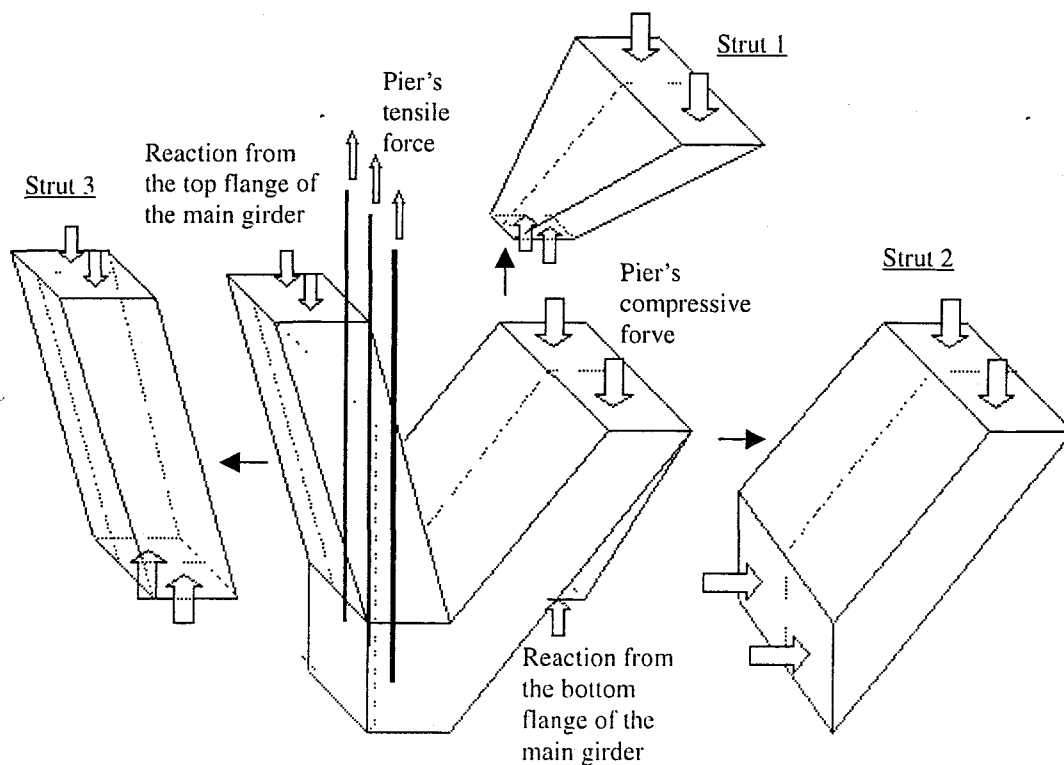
Force transfer mechanisms inside connection concrete of specimen C-1.
